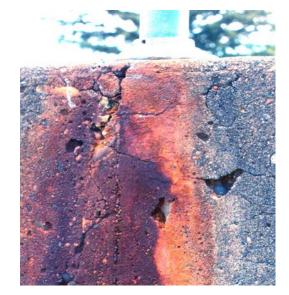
Guardrail Anchorage Corrosion
